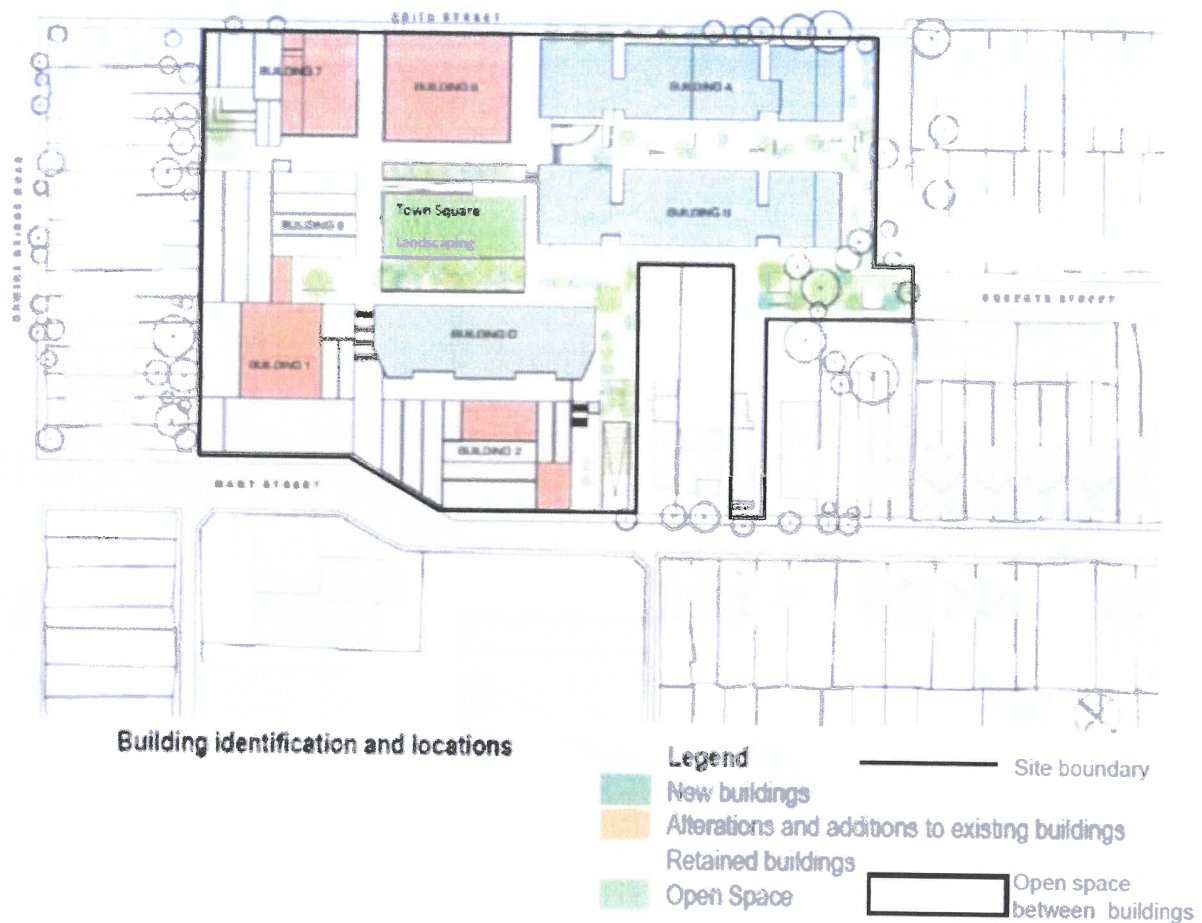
Indicative Site Layout (Source: Figure 3 Section 9.48 MDCP)
